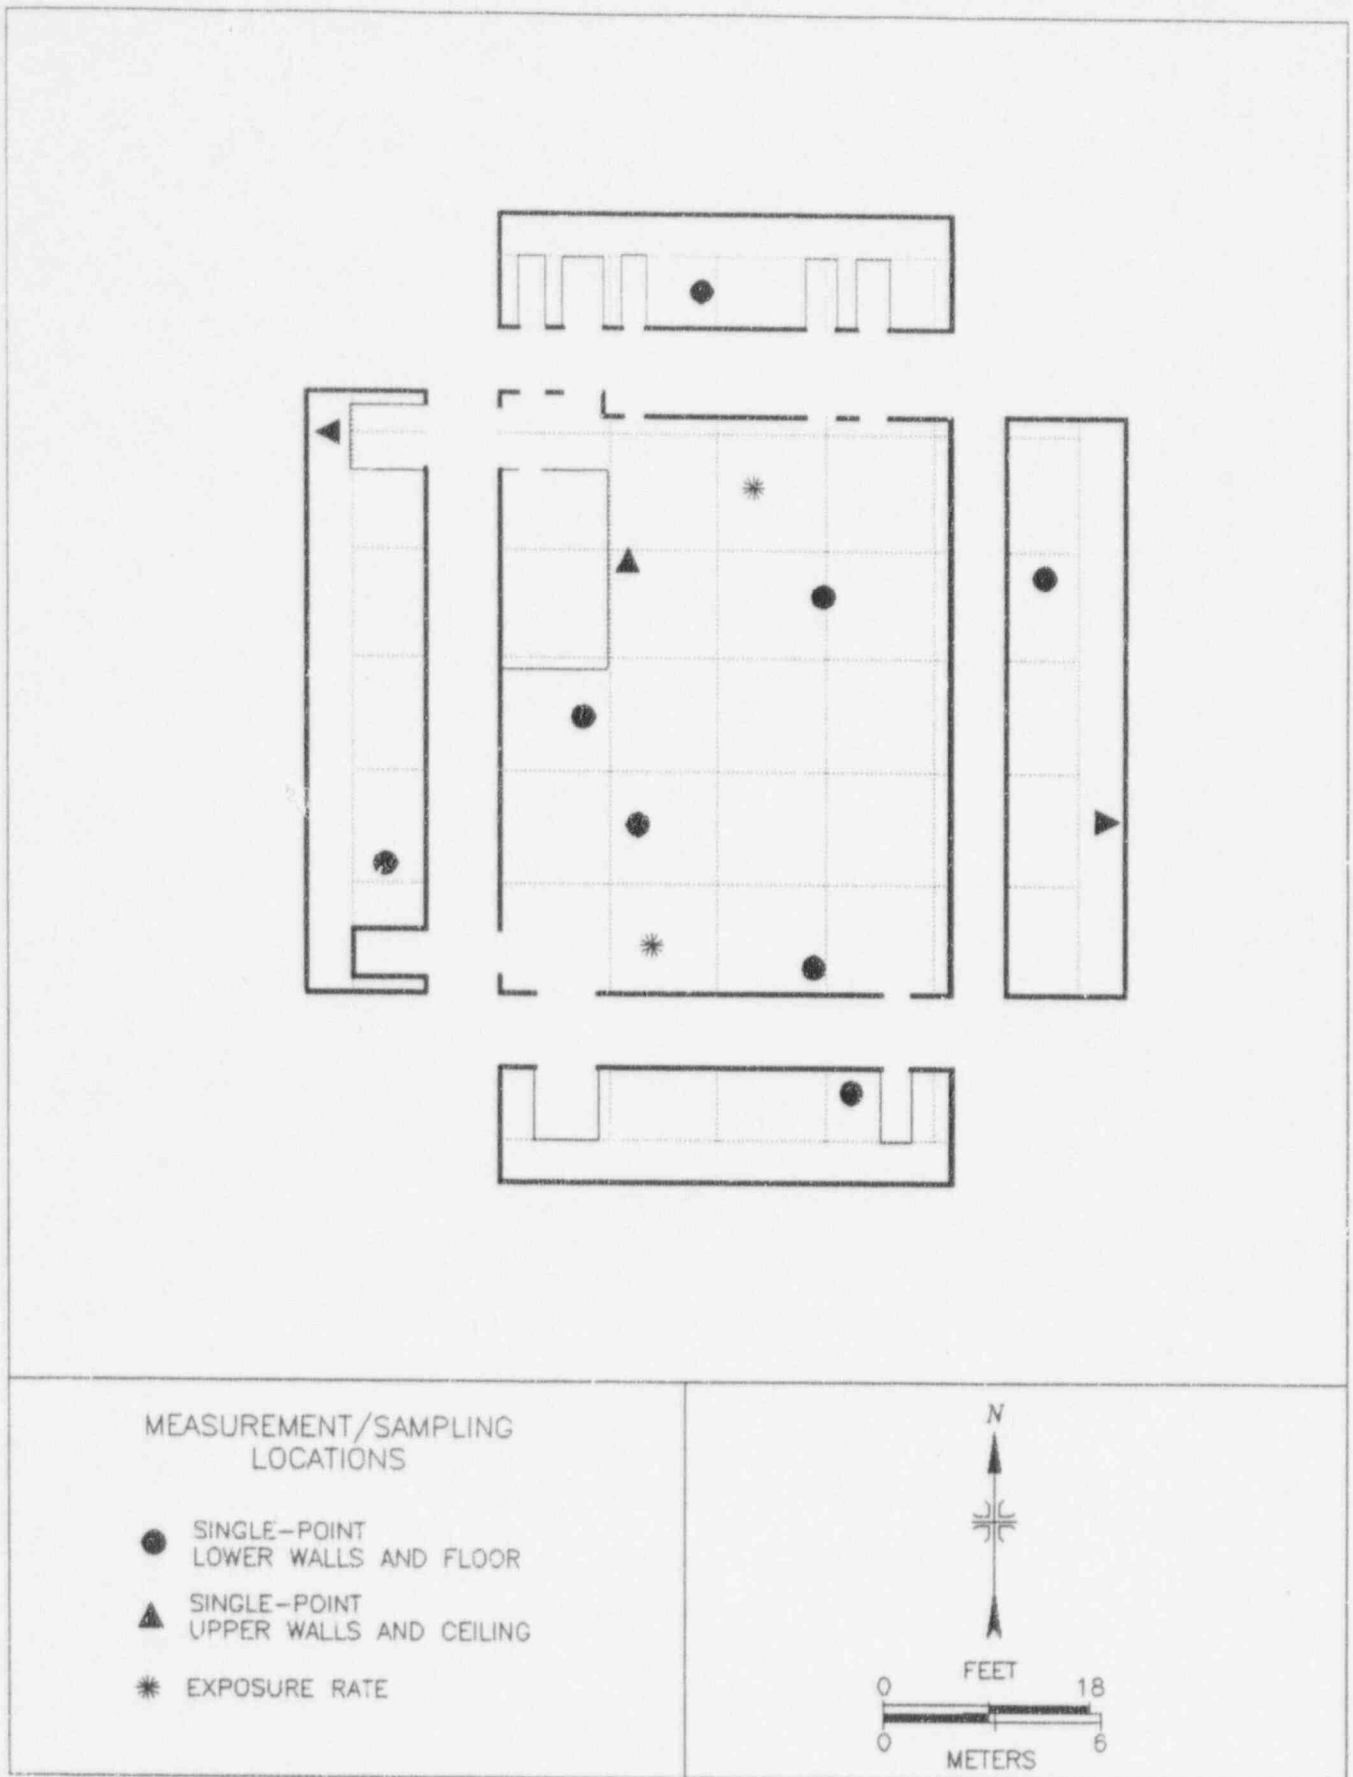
Building 1, Room 1 - Measurement and Sampling Locations
